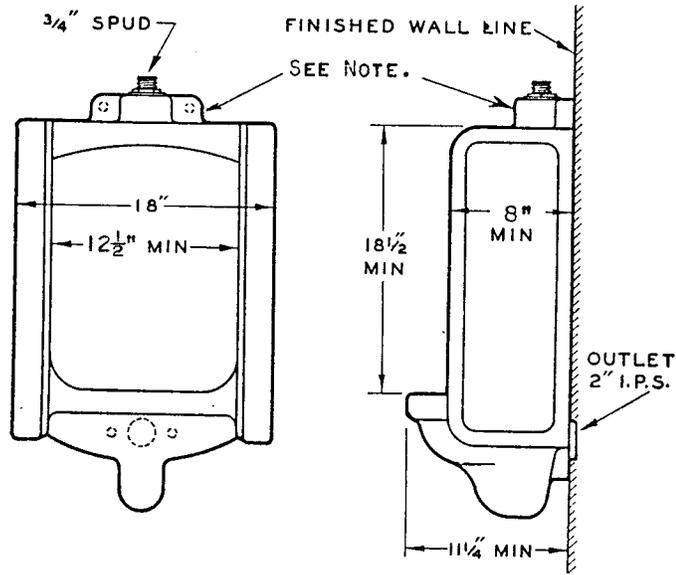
WALL-HANGING WASHOUT URINAL. (PAR. 4.3.1.)
